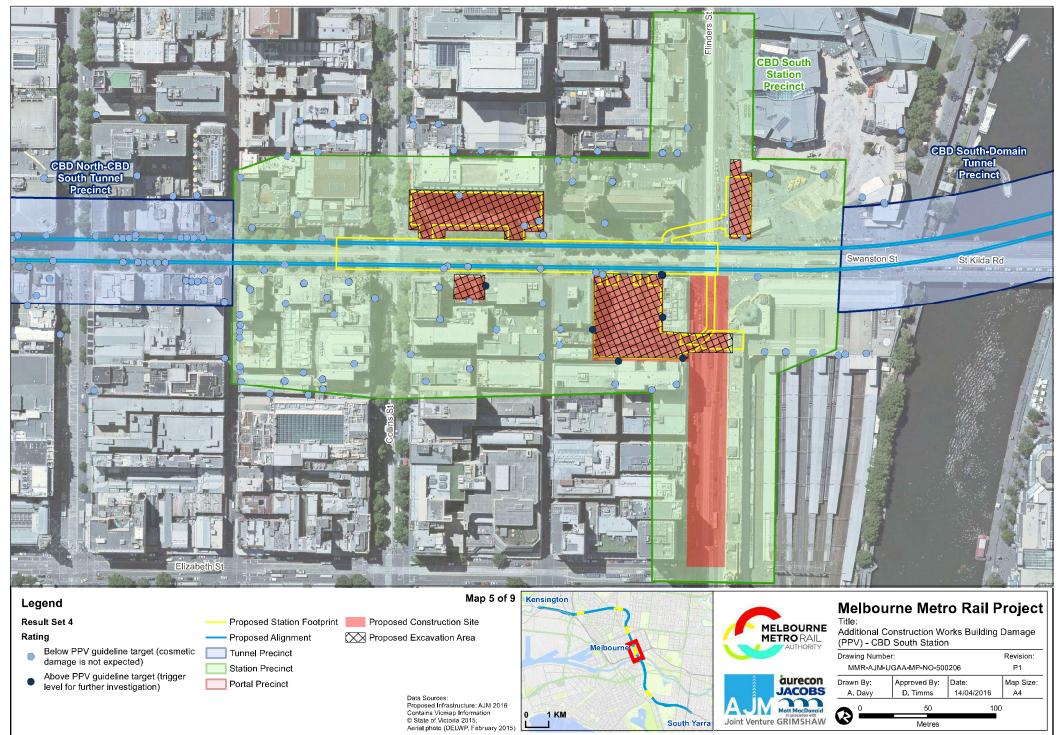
Colour coded building damage assessment due to Additional Construction Works – CBD South Station Precinct
